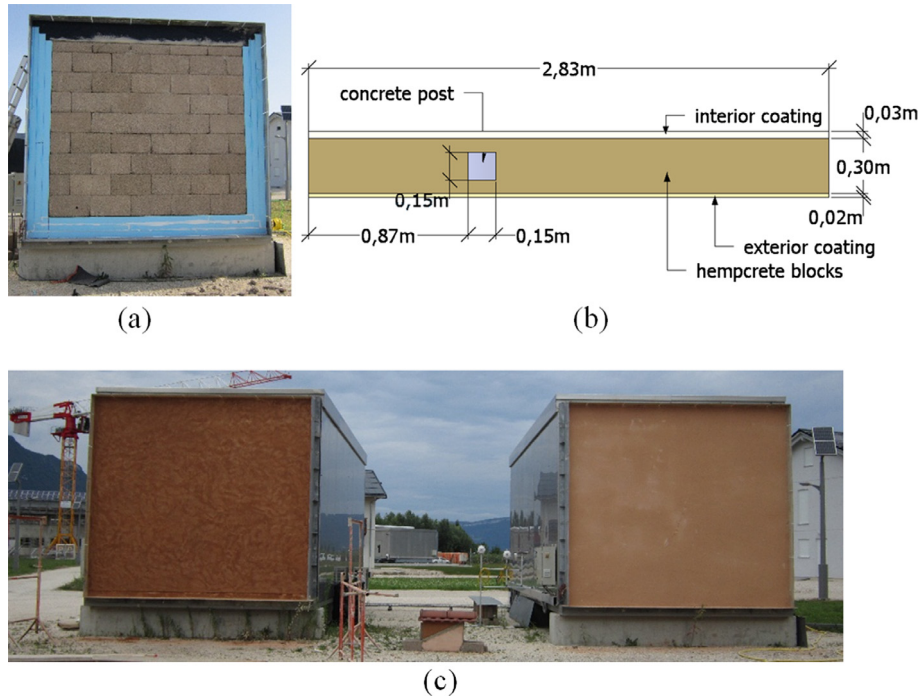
Picture and schemes of the experimental walls: (a) before exterior coating, (b) cross section, (c) the 2 cells with exterior coating.
